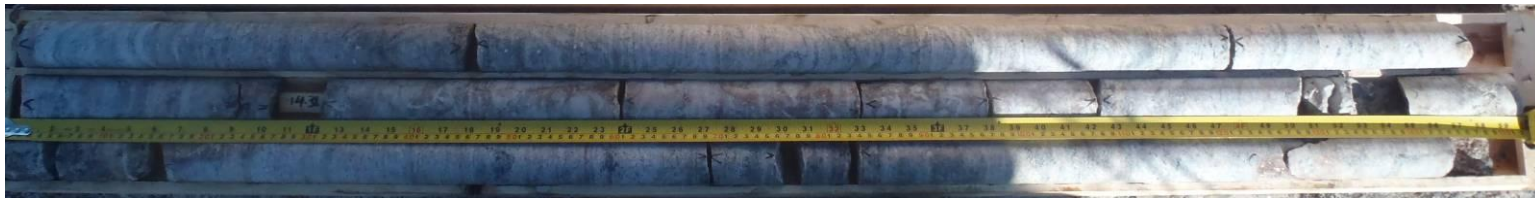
Core Box #4 of 9 (Runs 5-6, 12.7m – 16.9m)
